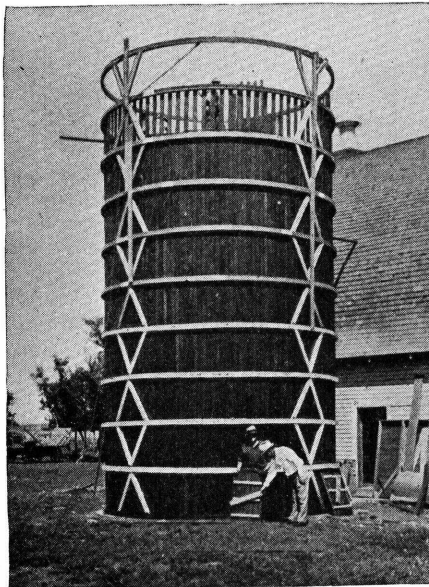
Wooden-hoop silo of short staves, almost complete.
